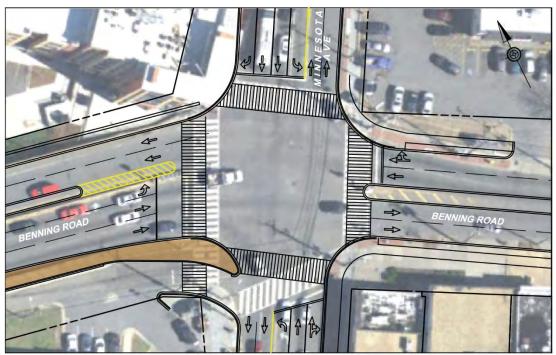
Proposed Lane Configuration at Benning Road and Minnesota Avenue Intersection
